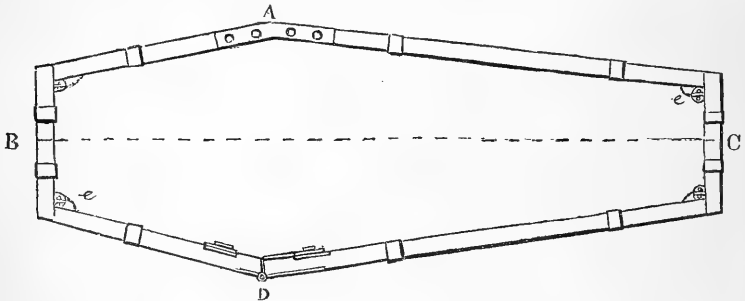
Plan of the Grave-Boards in use in the Tower Hamlets Cemetery.
